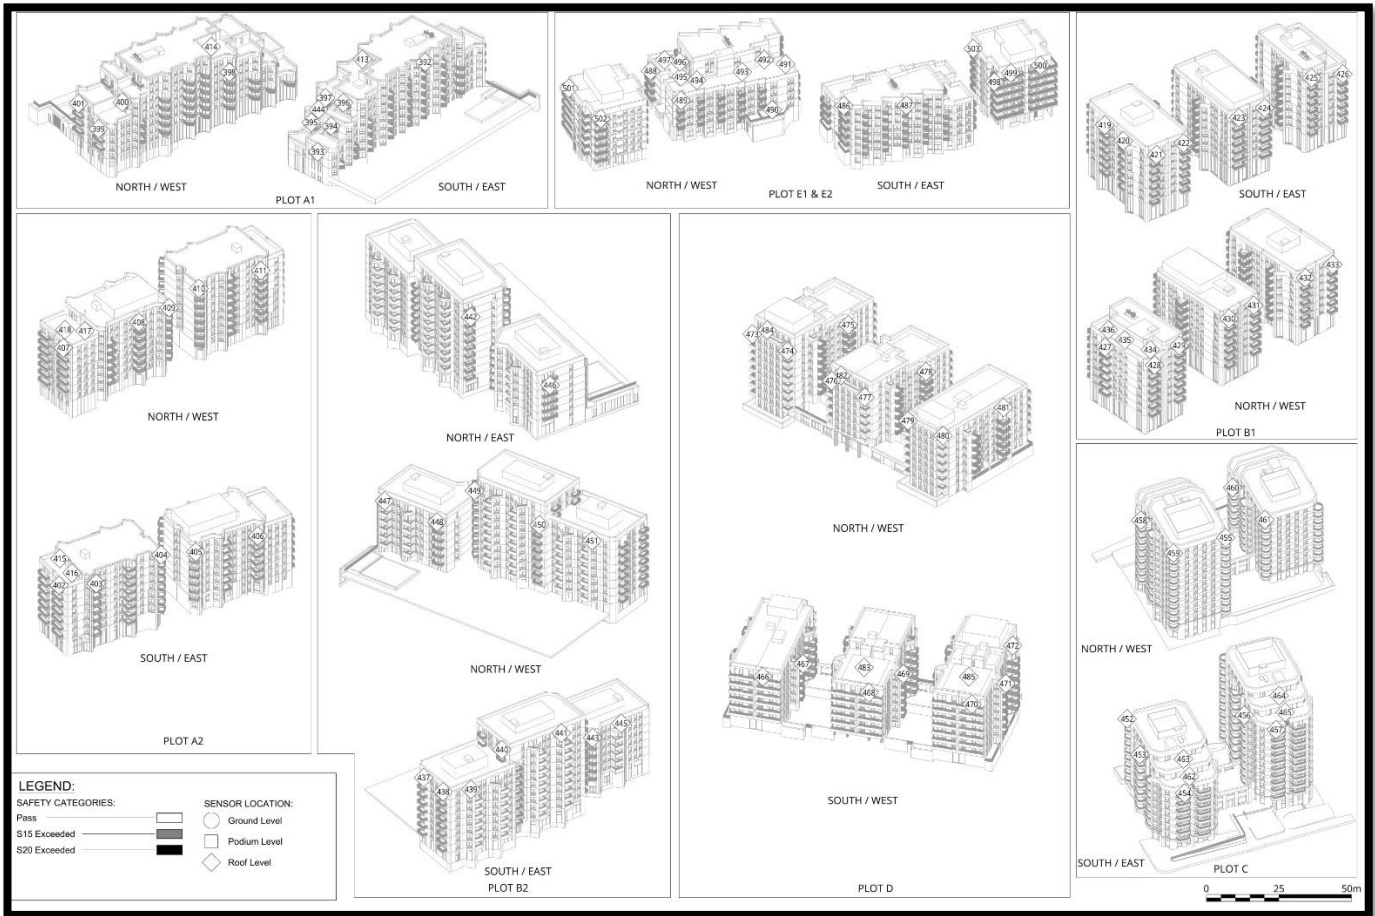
Configuration 2 - The Development with Existing Landscaping and Existing Surrounding Buildings – Ground Floor Wind Safety Conditions
